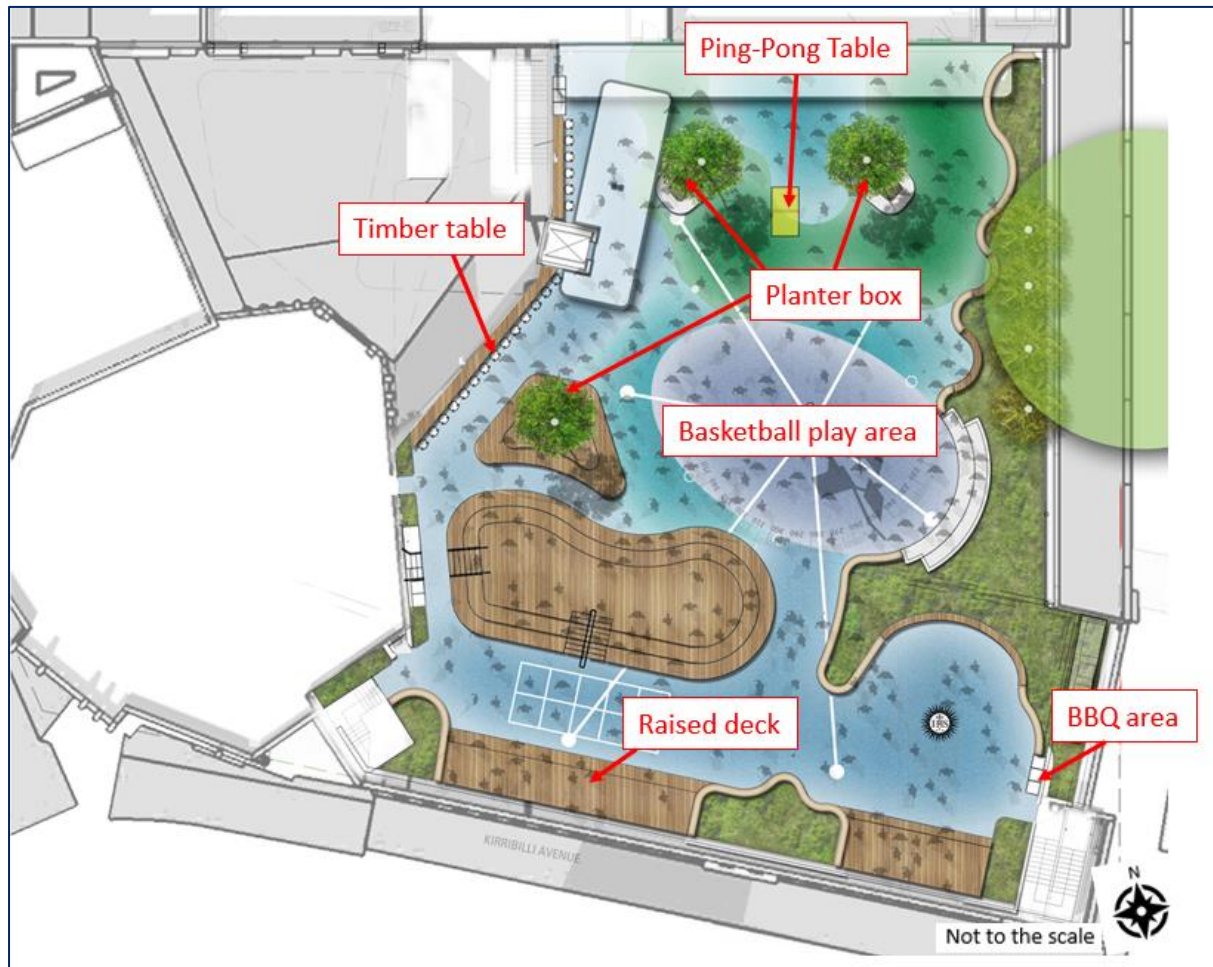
I Modified rooftop landscape plan (Source: Applicant's additional information 2023)
